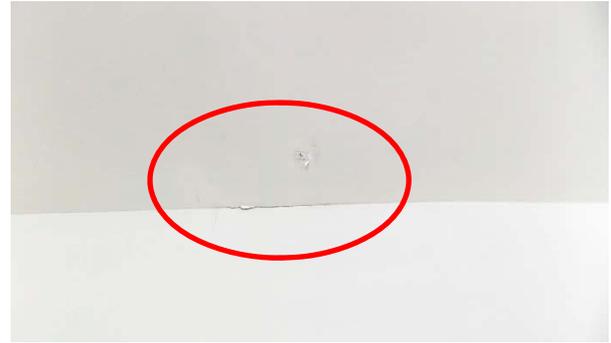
Gypsum board ceiling damage from roof leaks—fracture in wall-to-ceiling joint, paint blister and staining.
